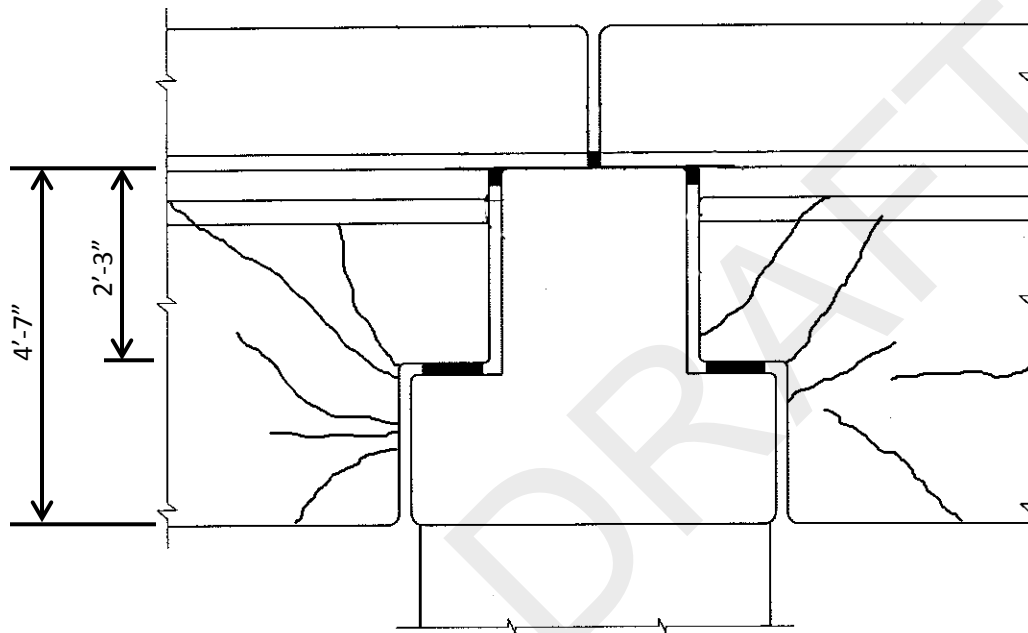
Typical Crack Location and Orientation at Tee Beam Ends
